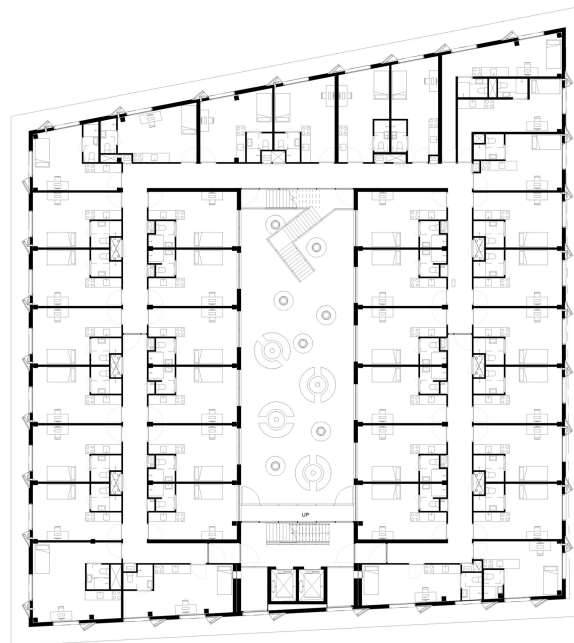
Floor plan Erasmus Student Housing 1<sup>st</sup> floor (Mecanoo)
